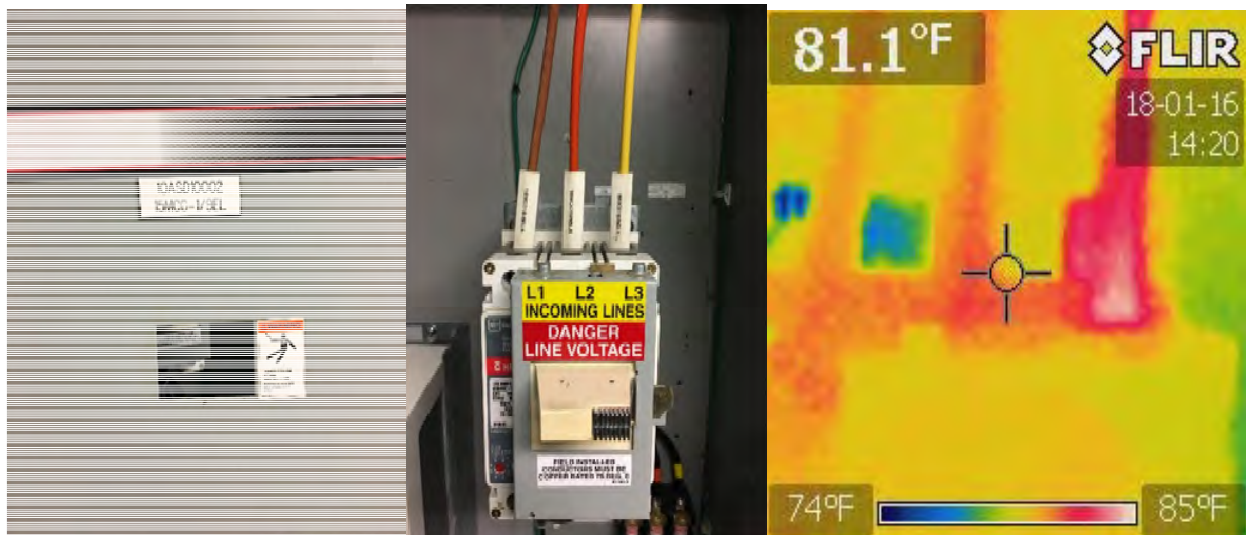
Plant drain pump #2 possible loose connection line side Phase C Corrective Action: tighten terminal
